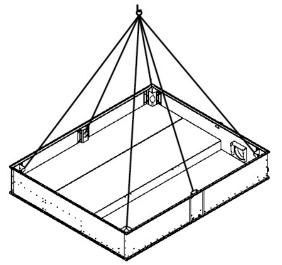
Lifting of basin section, single-fan units— "H" Dimension
